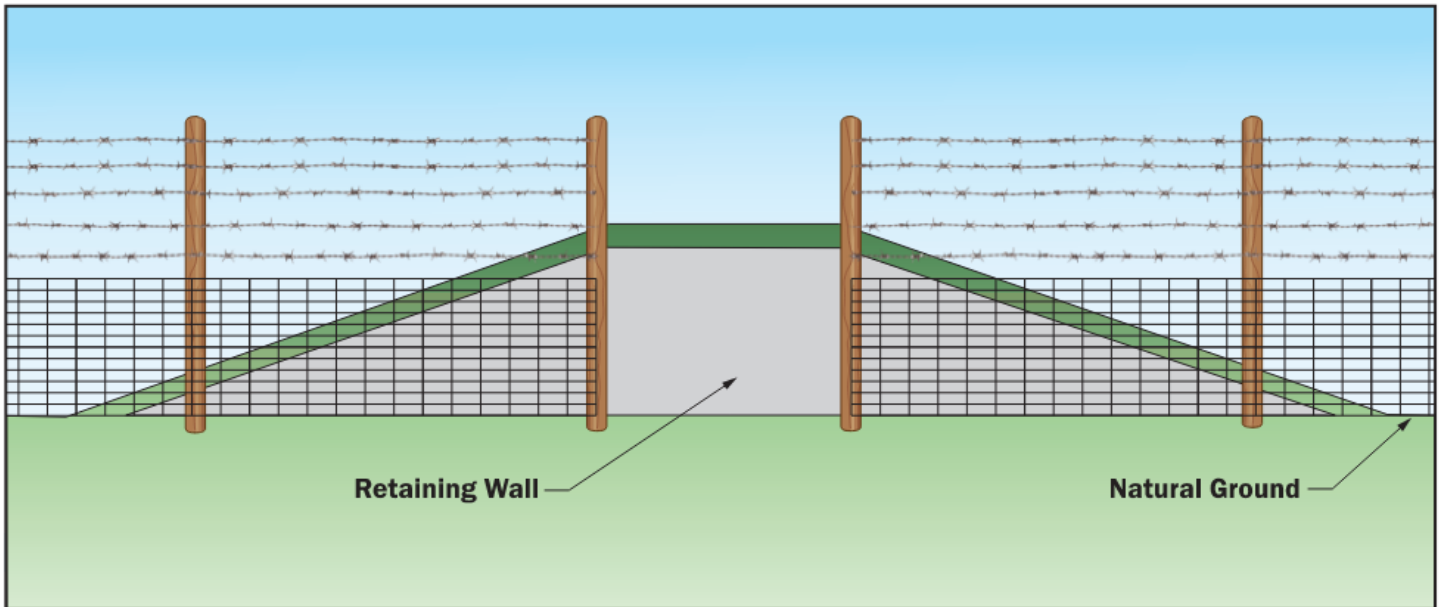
Jump-out view from off-site. The retaining wall supports the embankment on the roadside.
